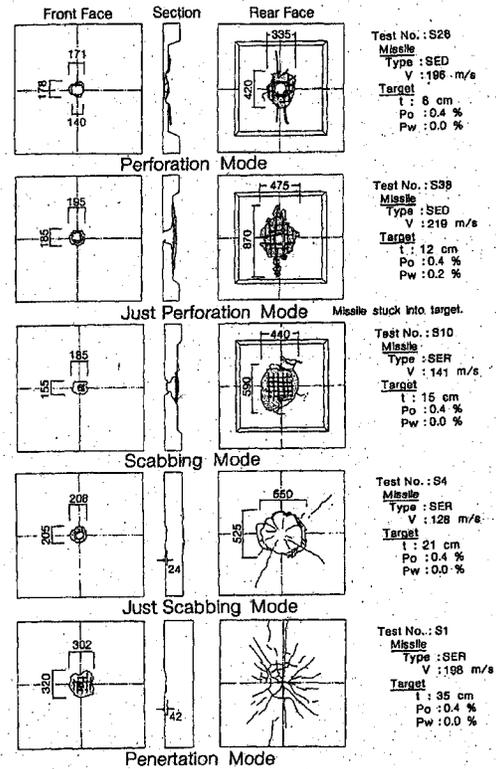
, Concrete slabs used in the small-scale tests presented in [6] and [7].
